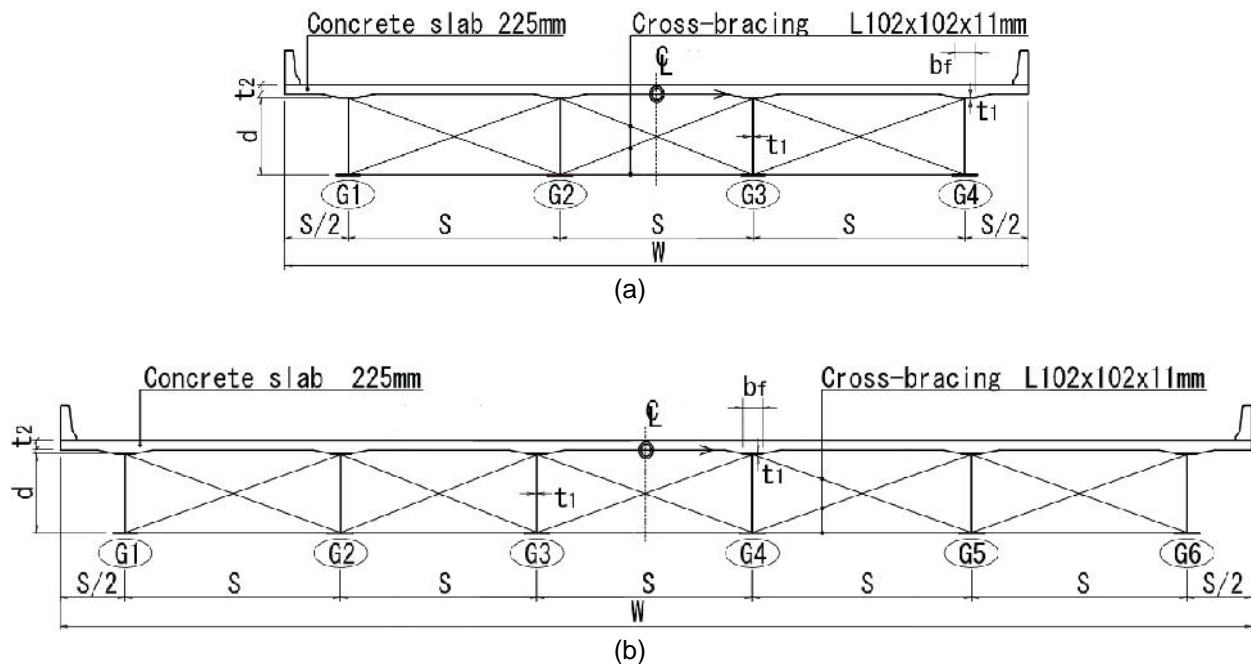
Cross-section diagram of a concrete slab over steel I-girder bridge for (a) one-lane; (b) four-lane
